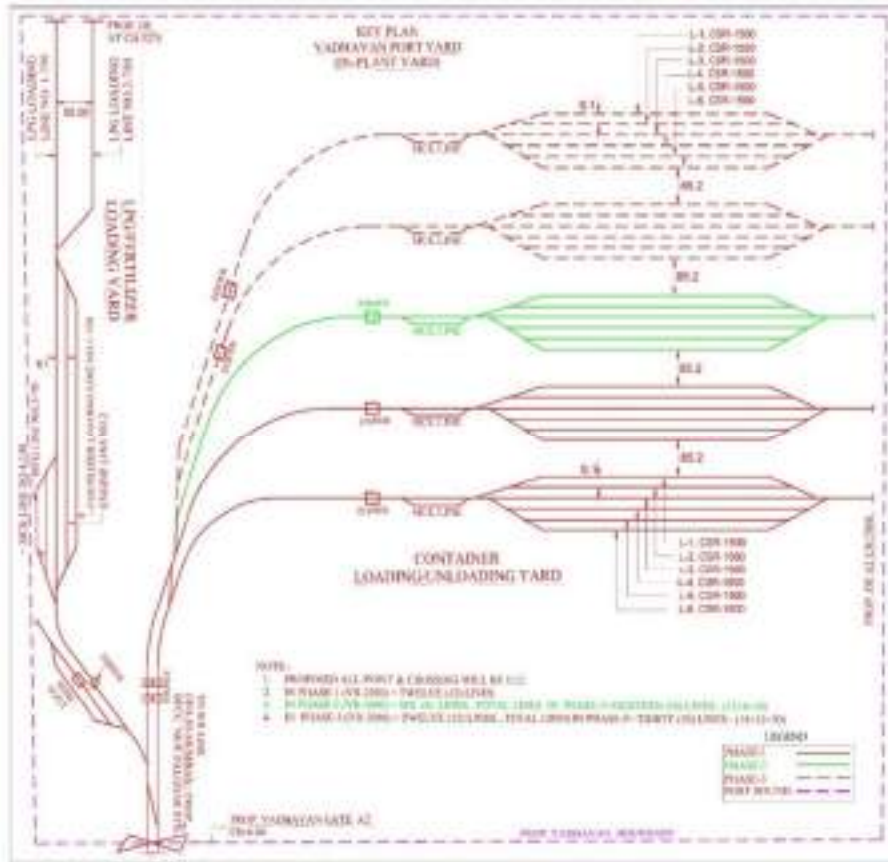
Schematic Key Plan of VadHAVAN in port rail yard
